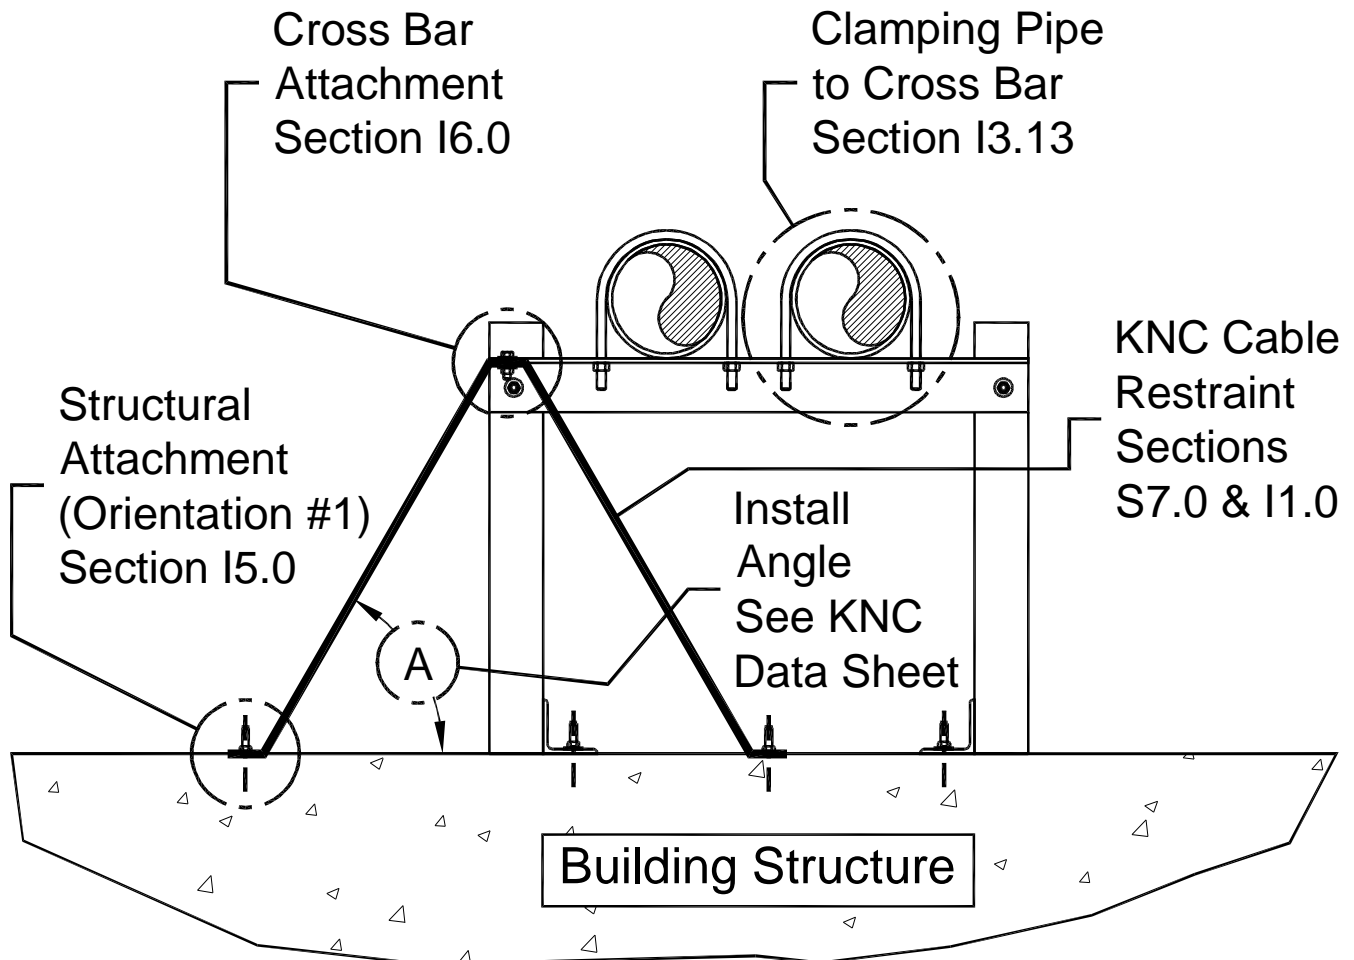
; Transverse (T) Cable Restraint Schematic Arrangement for Floor or Roof Mounted Pipe – Both Restraints Attached to One Side of the Cross Bar at the Vertical Leg
